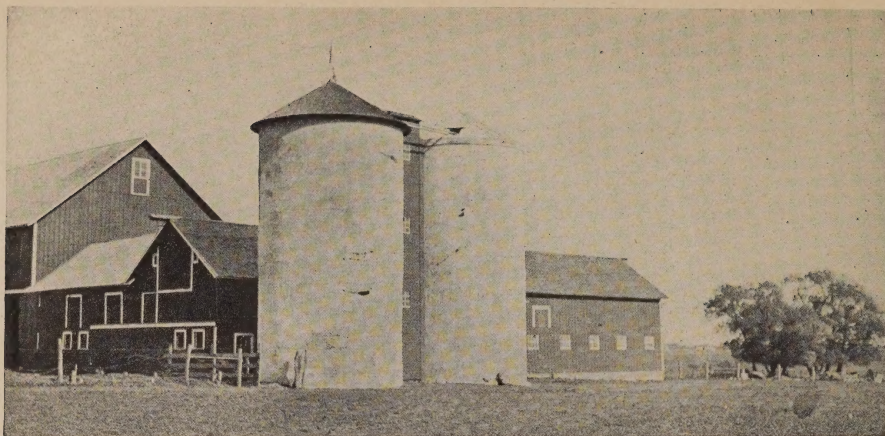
Twin circular silos of monolithic concrete. Notice the two types of roof.
